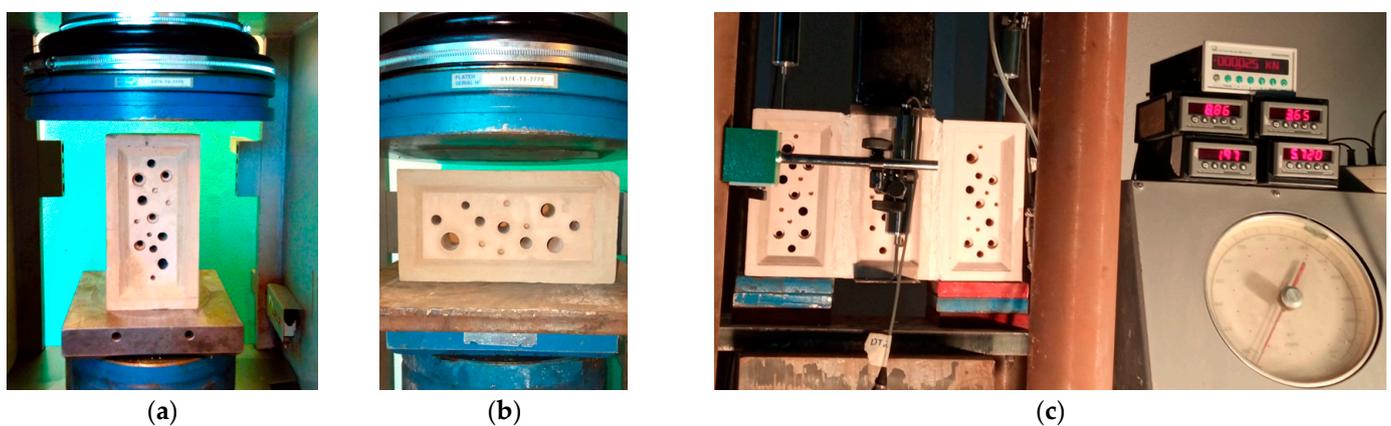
Experimental test setup of (a) compression test of solid brick with the loading direction perpendicular to bed joints; (b) compression test of solid brick with the loading direction parallel to bed joints; (c) direct shear test of brick triplet with Kerakoll binding mortar.
